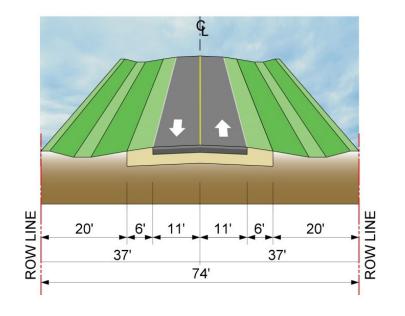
TWO-LANE UNDIVIDED RURAL TYPICAL SECTION BLAIR DRIVE ACCESS
